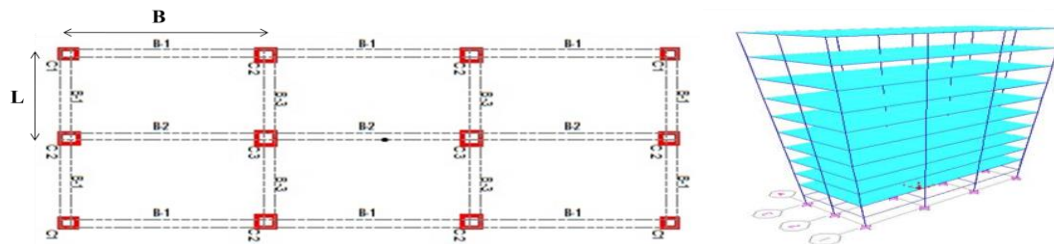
Plan Layout (Left), 3D view of the structure (Right)
